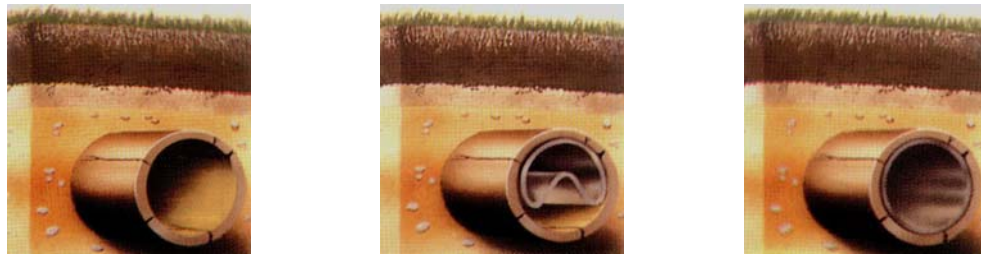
Close fit liner pulled into a water pipe (Source: Rabmer)
